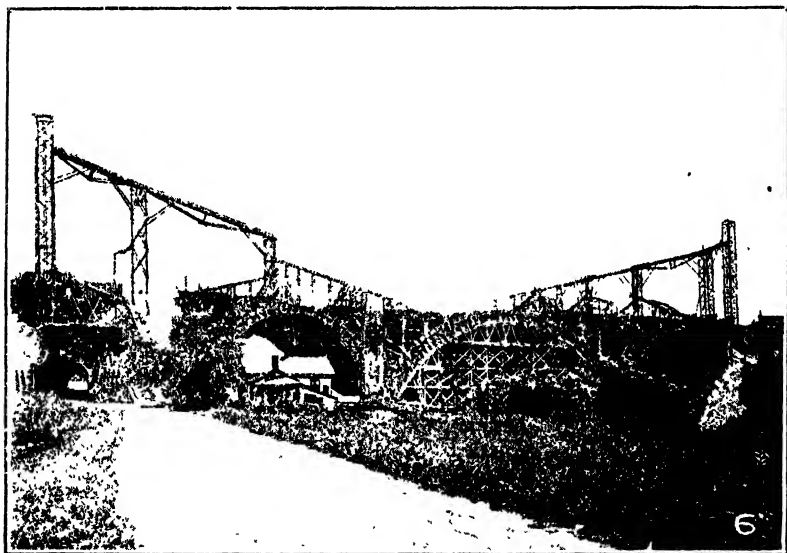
Mixing plant at Painesville Bridge. (See p. 275.)
